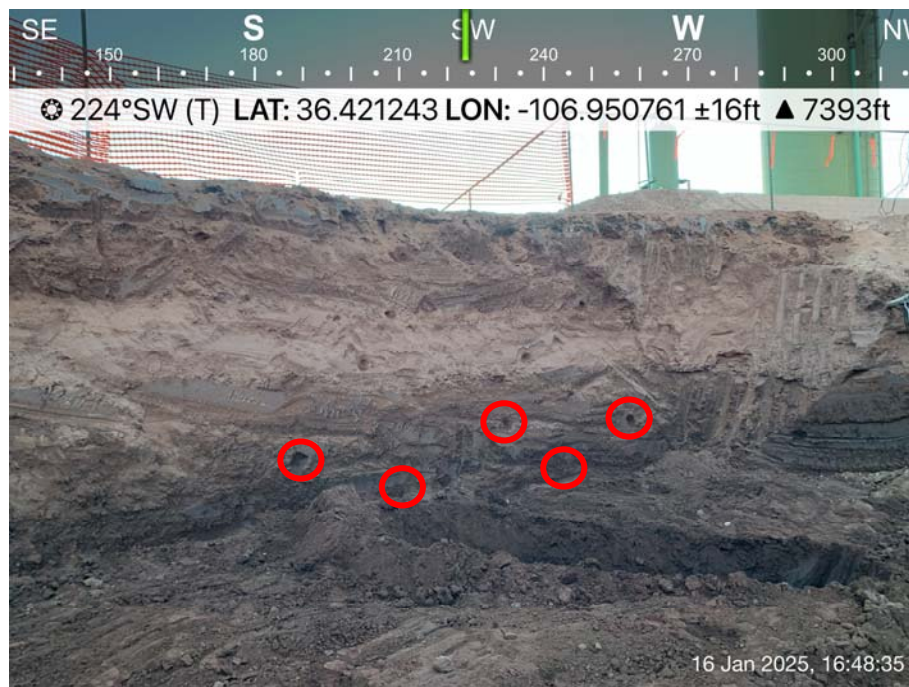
SS08 collected as a five-point composite sample 4-10 ft bgs from southwest sidewall of excavation.
